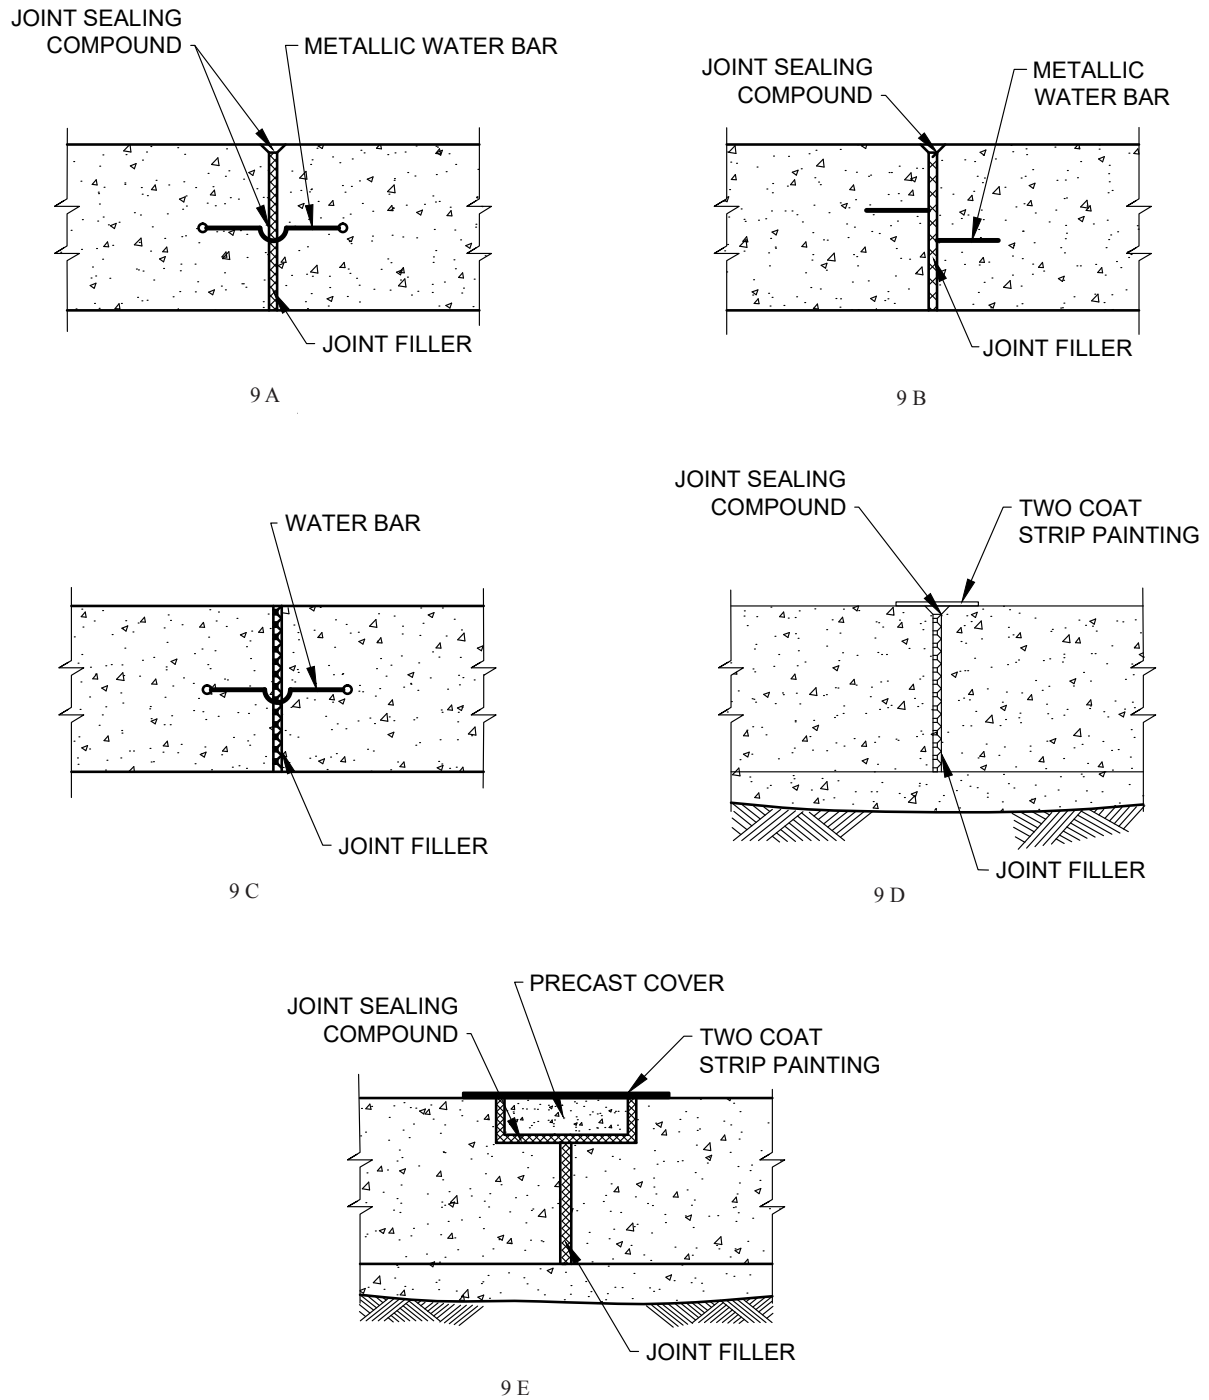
TYPICAL DETAILS SHOWING USE OF JOINTING MATERIALS
